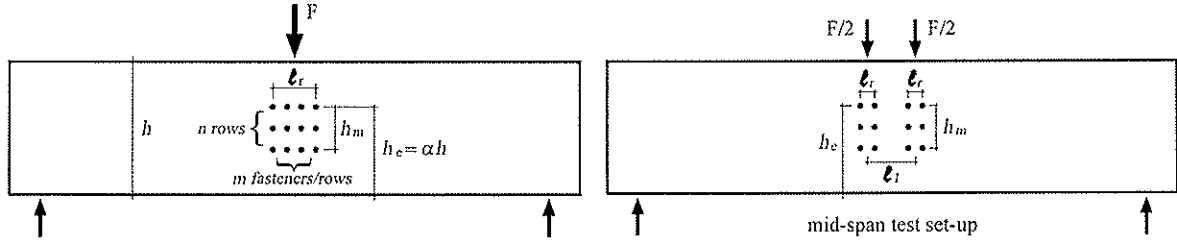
Parameters of connections geometry in case of compact connections (left) and for connections made with two cluster of fasteners (right).
